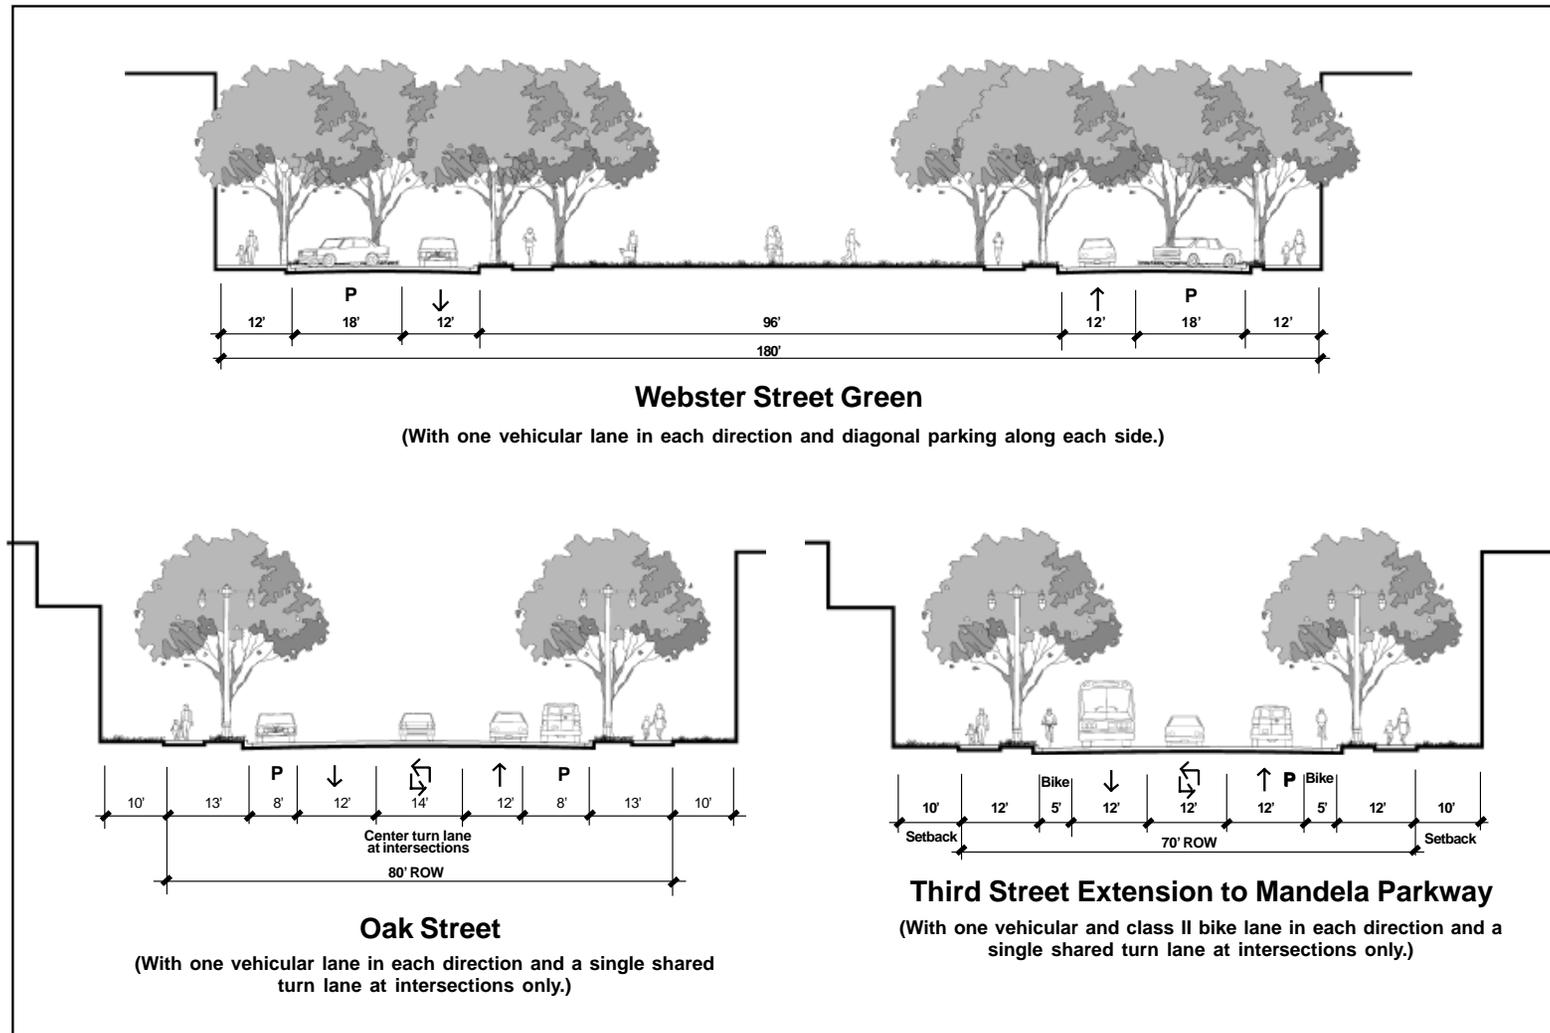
Jack London District Illustrative Street Cross Sections
